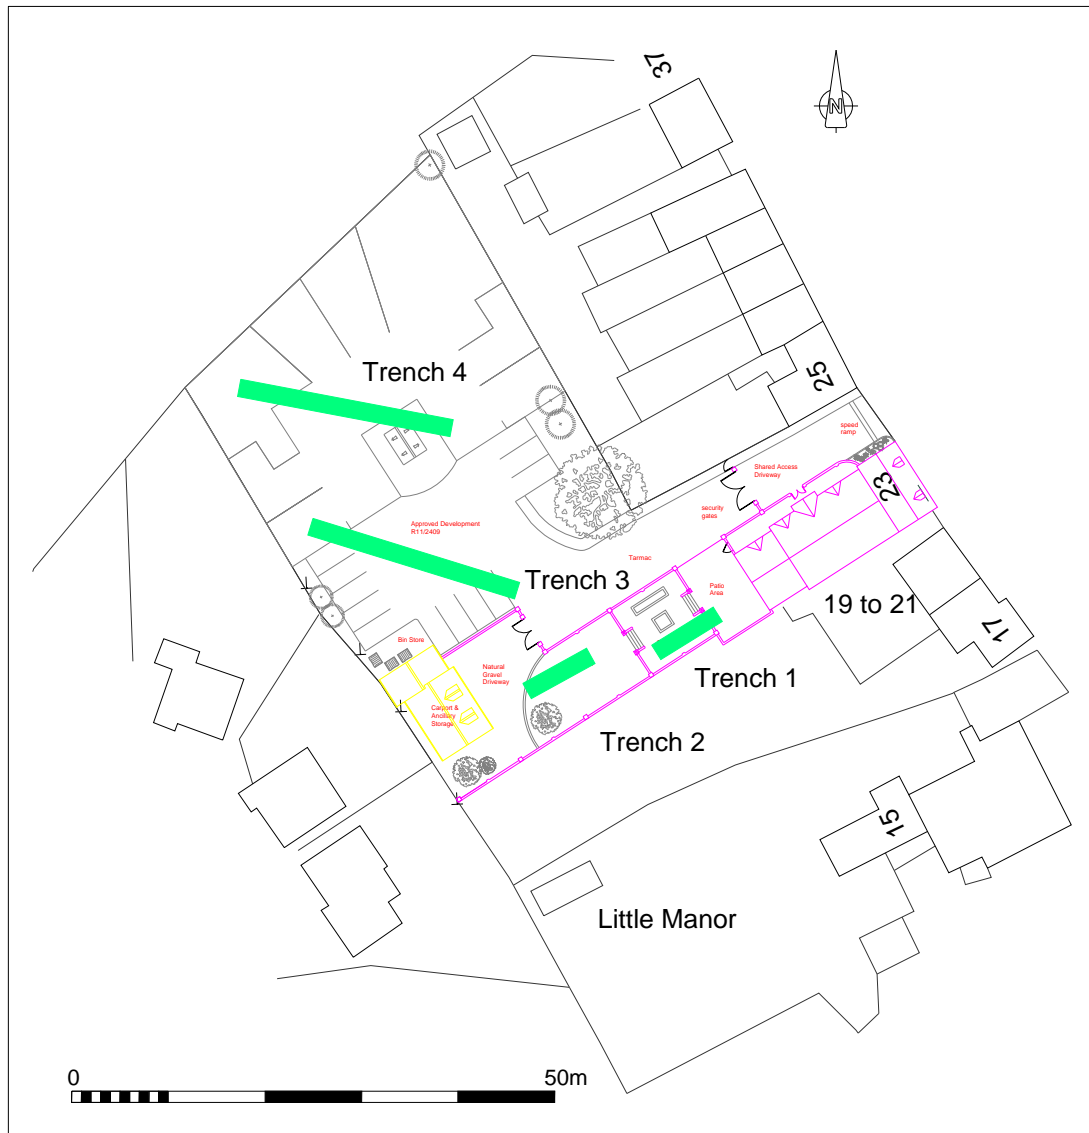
Trench Location plan (adapted from mapping supplied by Aplan Architectural Design Ltd.).
